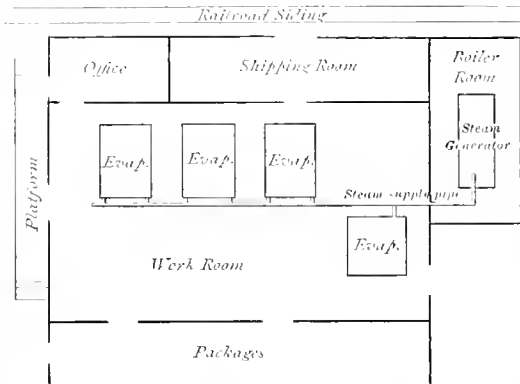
GROUND PLAN OF HARDING & SWEETING'S STEAM EVAPORATING BUILDING, SOMERSET, N. Y.
